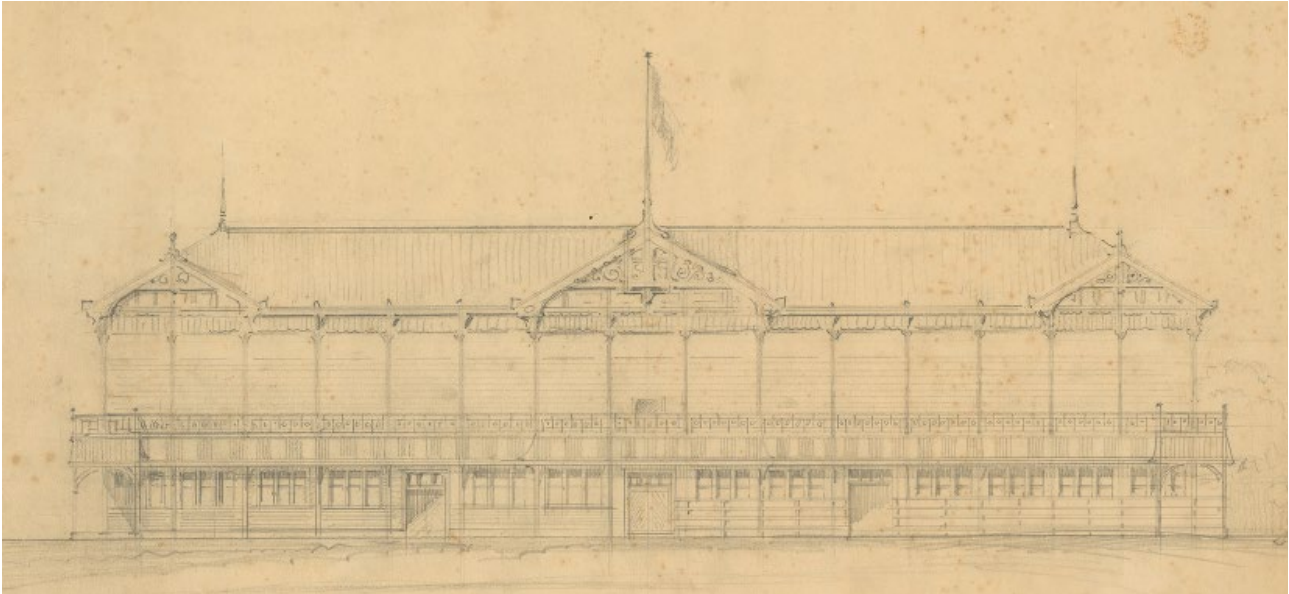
Proposed, unrealised elevation sketch, Brunswick Street Oval Grandstand, 1888.
